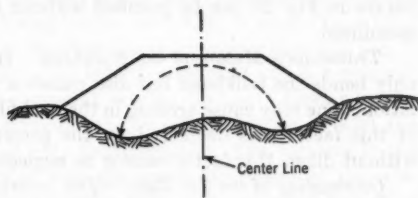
SETTLEMENT OF A ROADWAY EMBANKMENT
